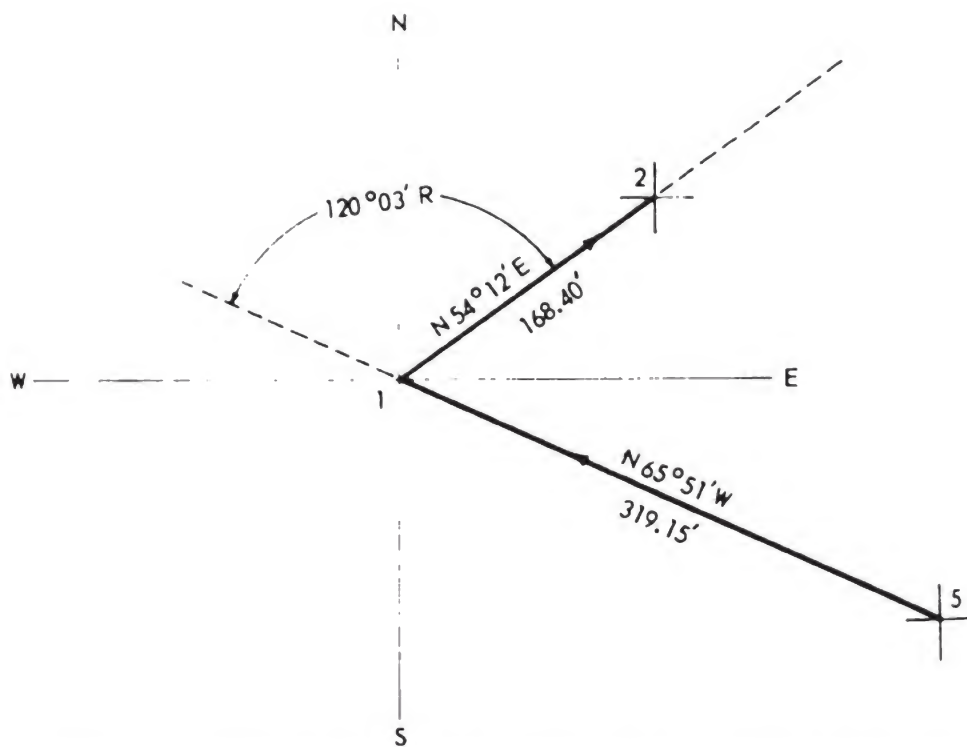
Finding the bearing for a course when an observed angle from a known bearing is given.
